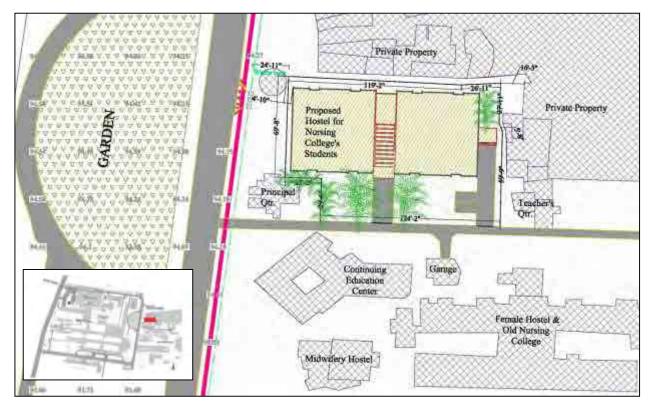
Candidate Site's Location and Layout Plan for Construction of the Nursing College in Mymensingh
